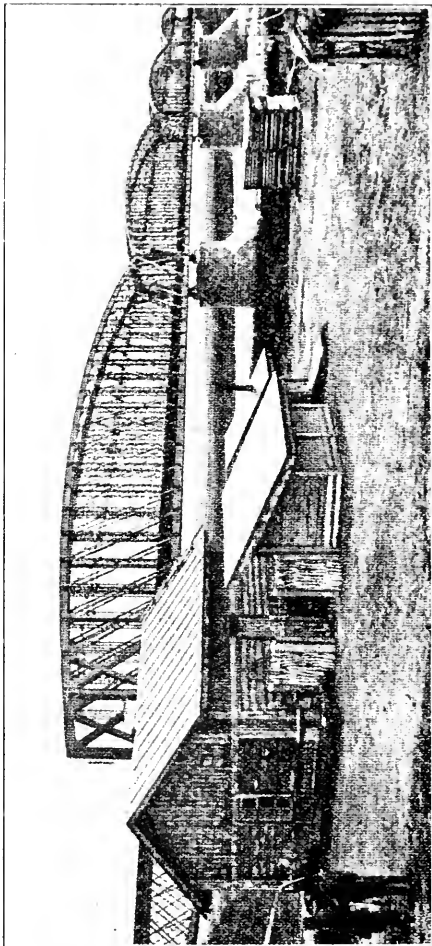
Route L. Bridge over the Tobol at Kurgan.
